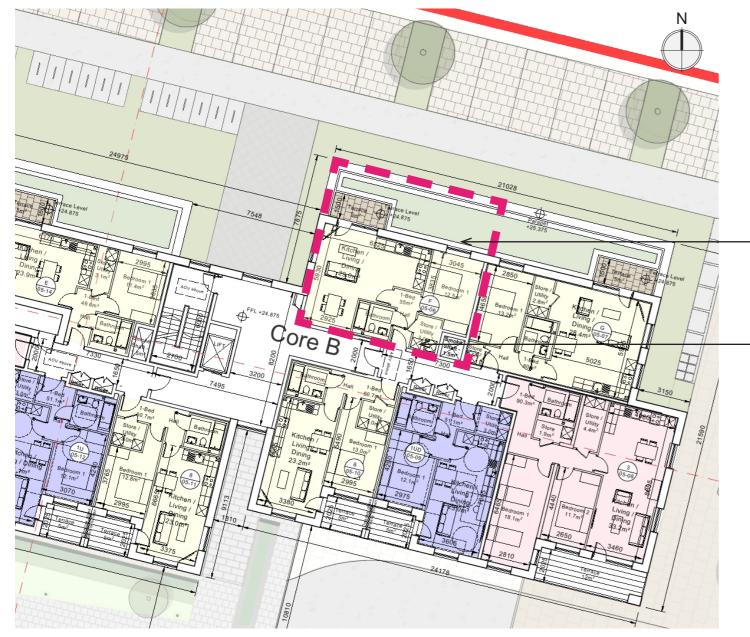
Block 6 Fifth Floor Key Plan with Unit 06-05-06 highlighted
